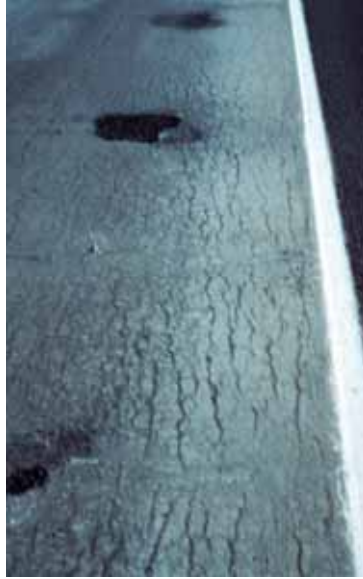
Map cracking with preferred longitudinal trend in continuously reinforced concrete pavement.
